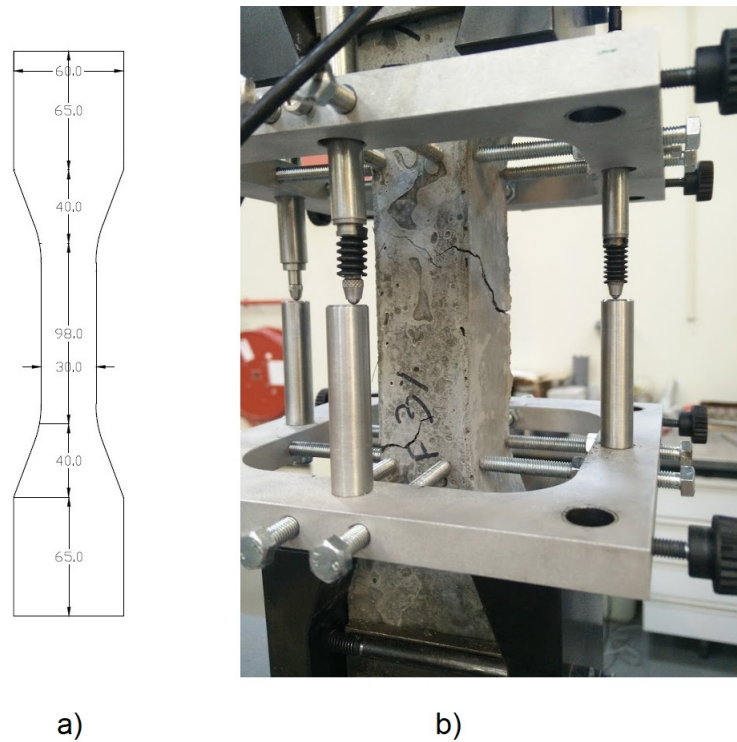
Uniaxial tensile test setup: a) Specimens geometry [unites mm] and b) LVDTs arrangement.
